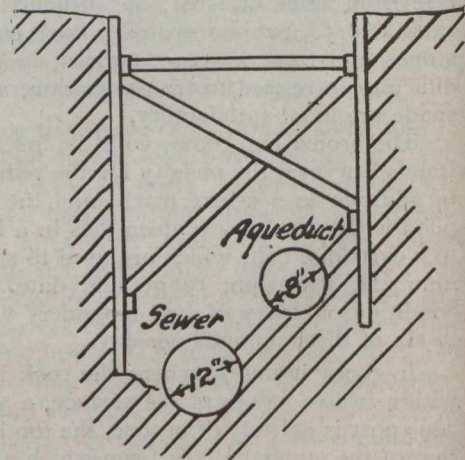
Showing Arrangement of Water and Sewer Pipes
